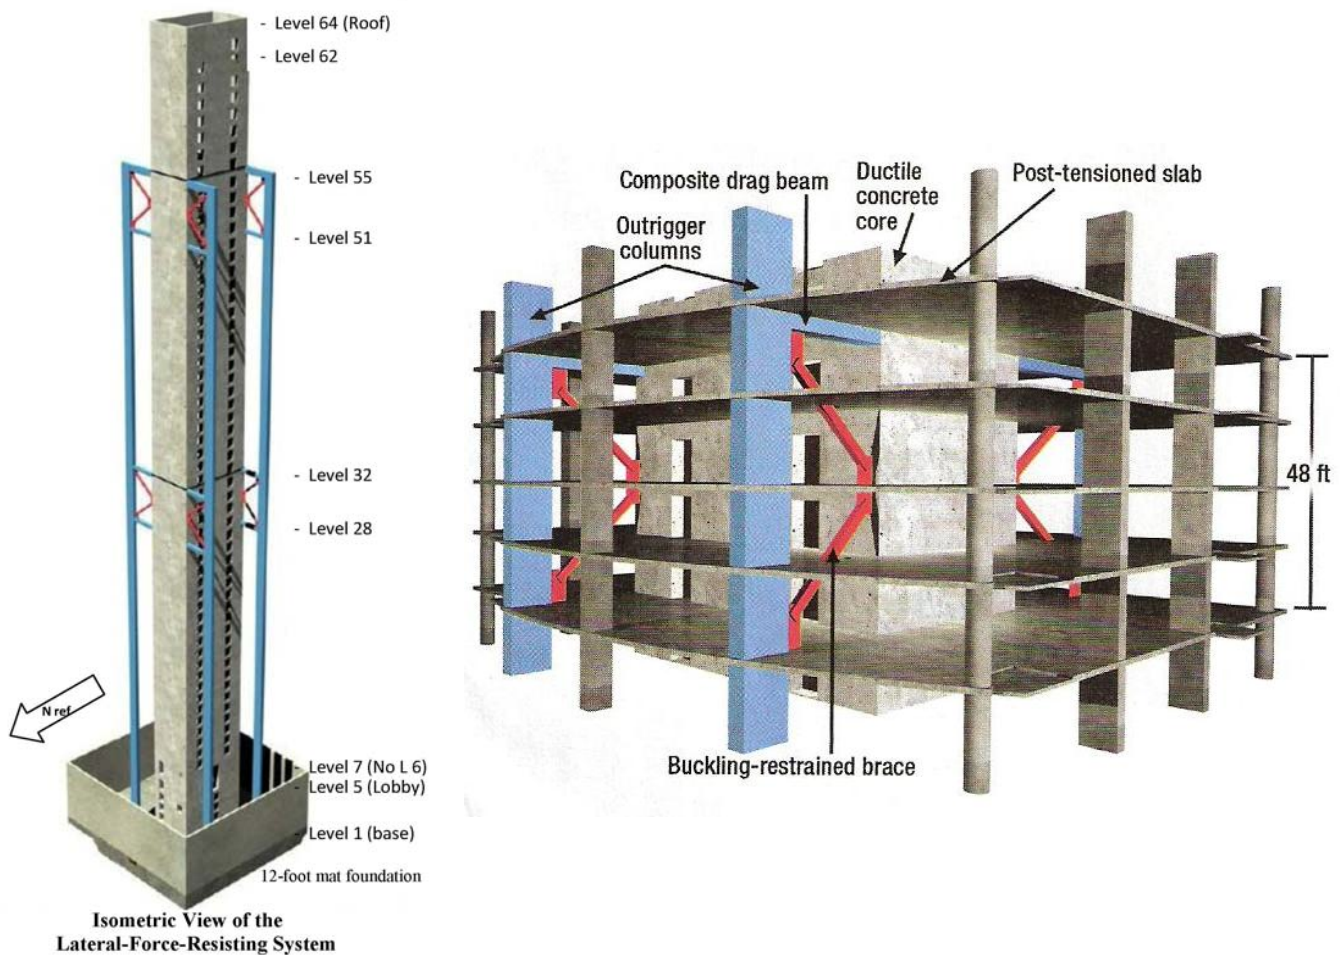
Lateral force resisting system of One Rincon Hill Tower and the outrigger systems. (from Klemencic et al., 2006)
